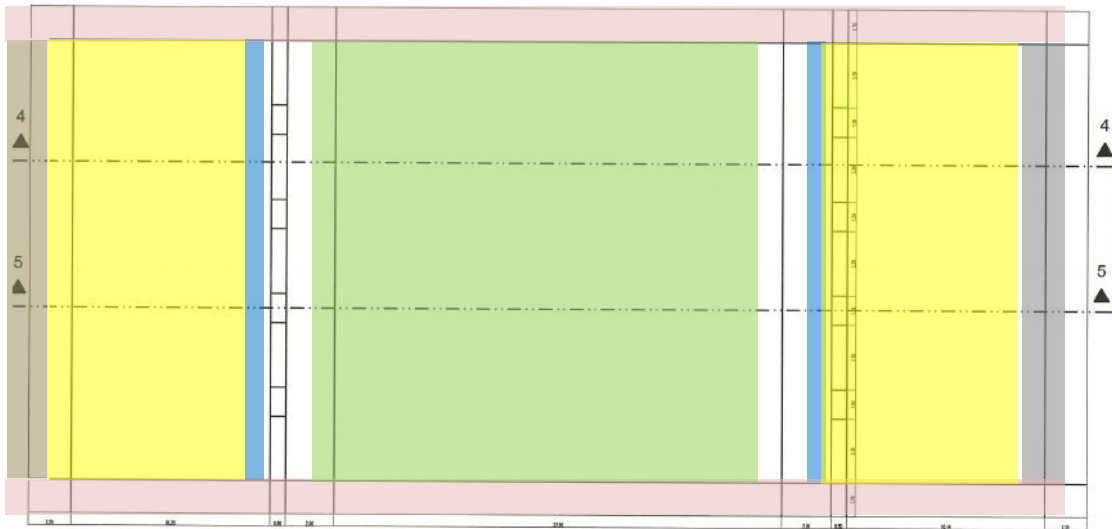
Disposition of exterior (blue), interior walls of bridge (grey) deck ceiling slab (green), supporting elements for deck ceiling (white), tunnel ceiling (yellow) and cantilever slabs (brown)
